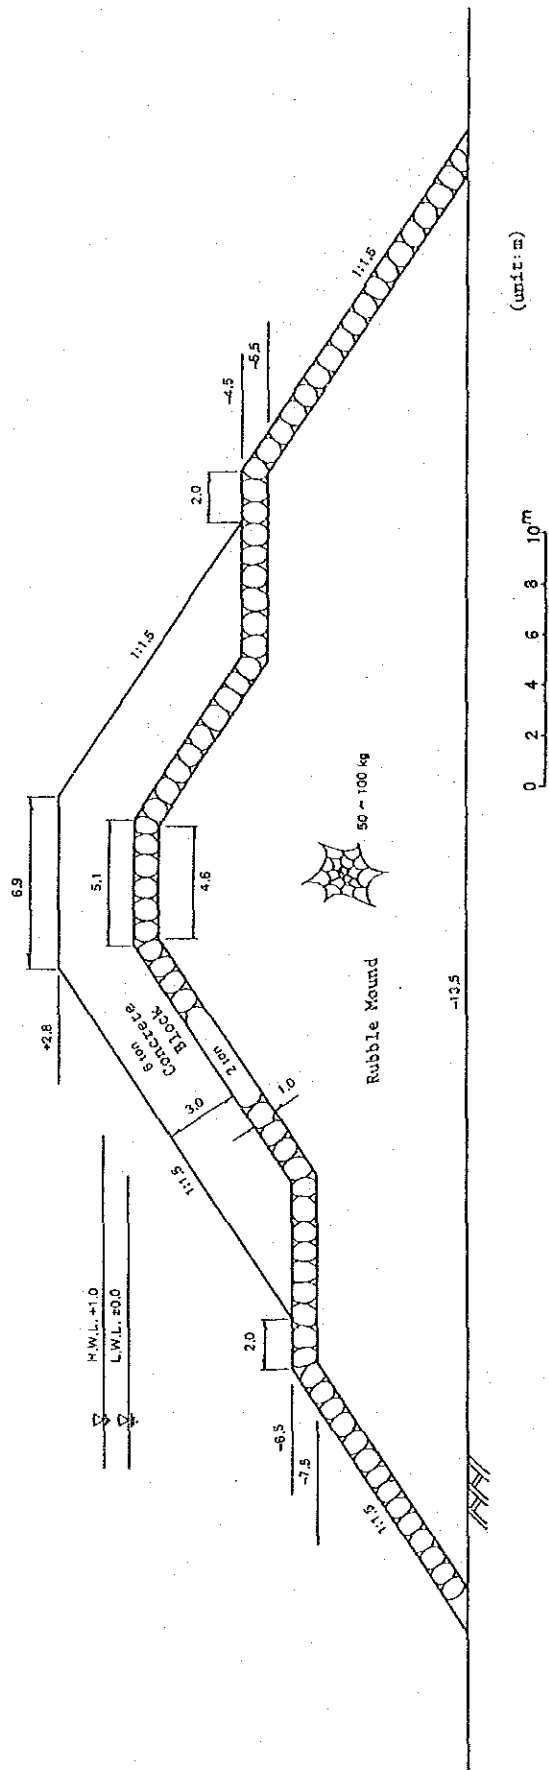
Cross Section of Breakwater (Alternative A)
